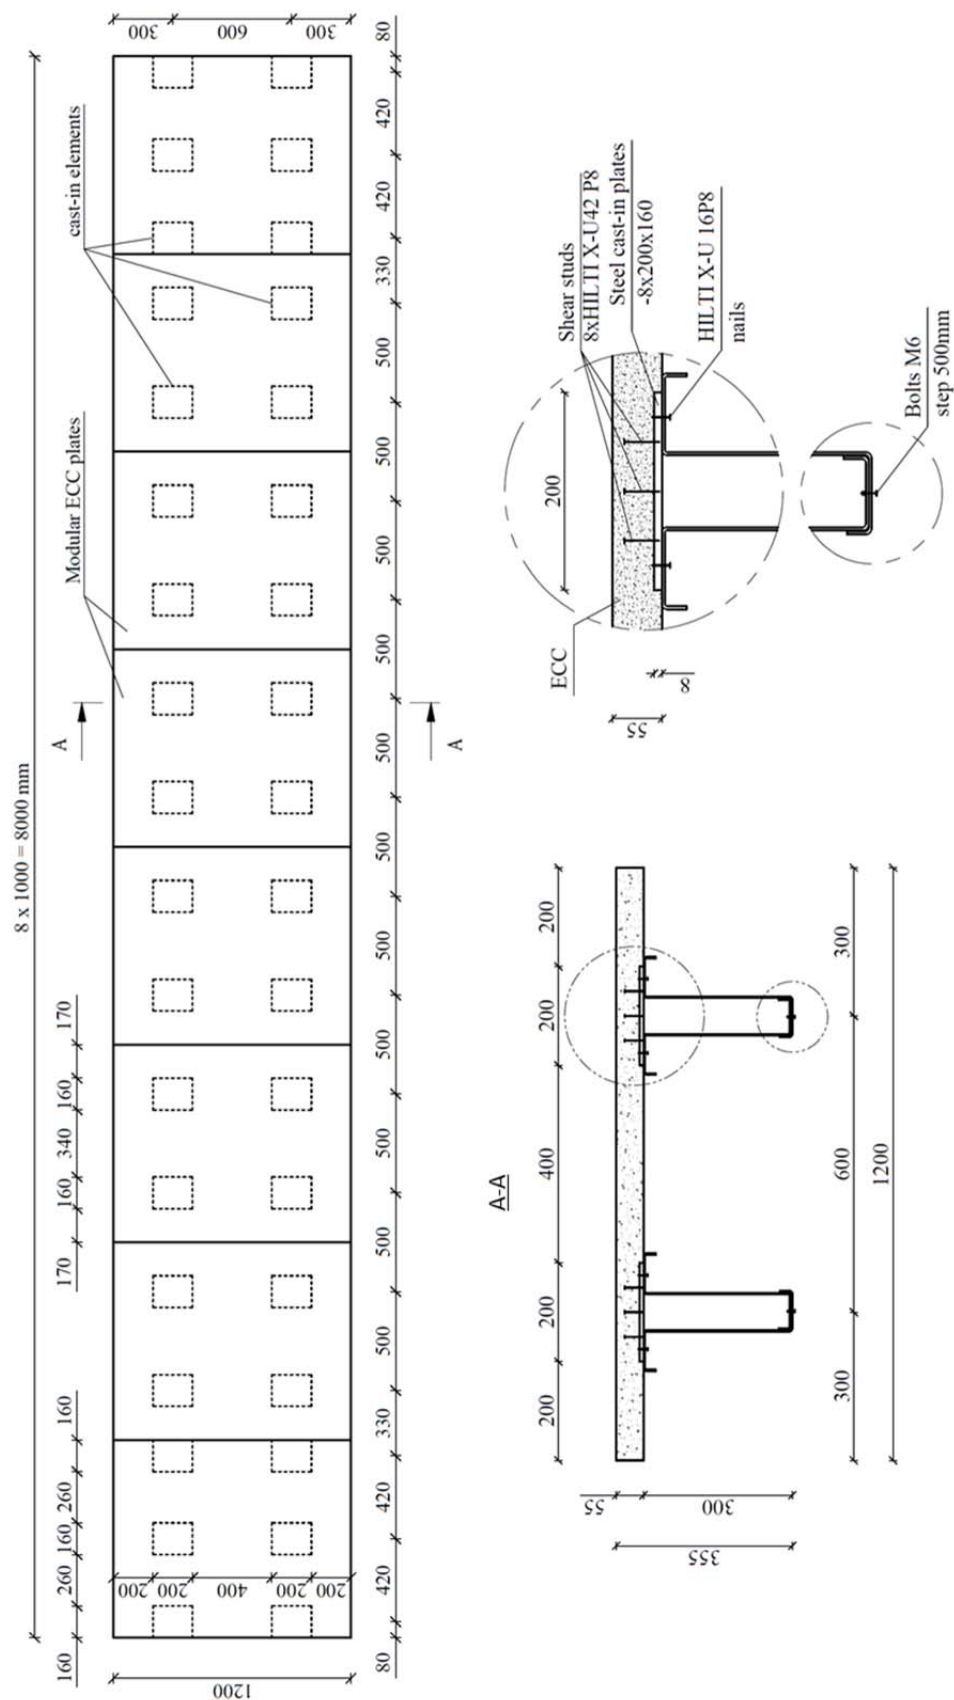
Design details of modular lightweight floor and roof panel MP2
